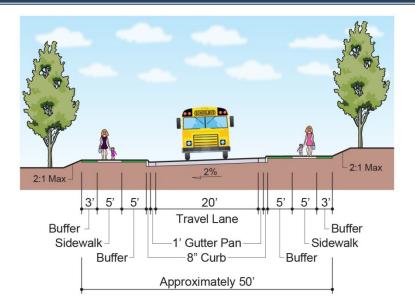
Proposed Typical Section (One-Way Race Road Relocated)
